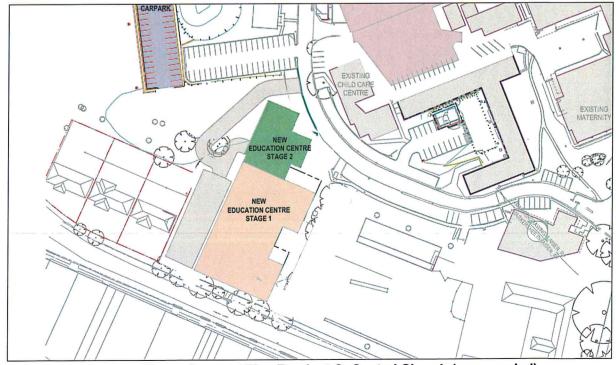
Wahroonga Estate Concept Plan Precinct C: Central Church (as amended)
